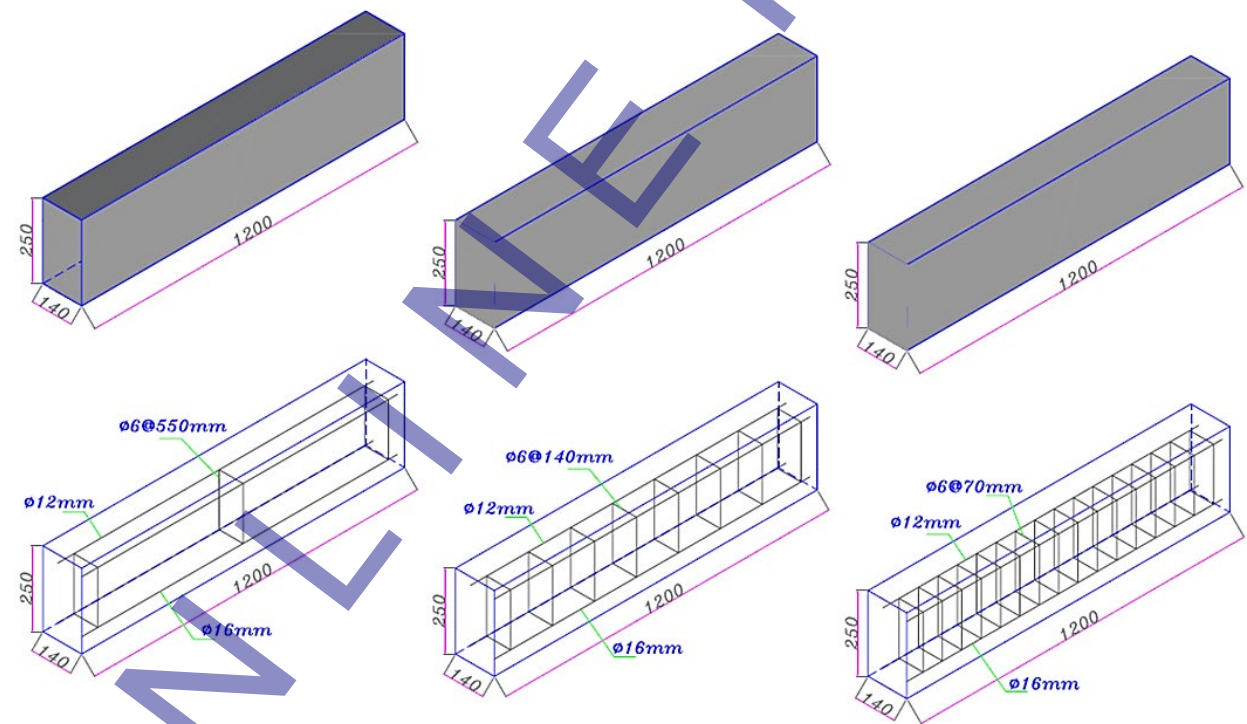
Cross-sectional details of the hollow and solid concrete beams
